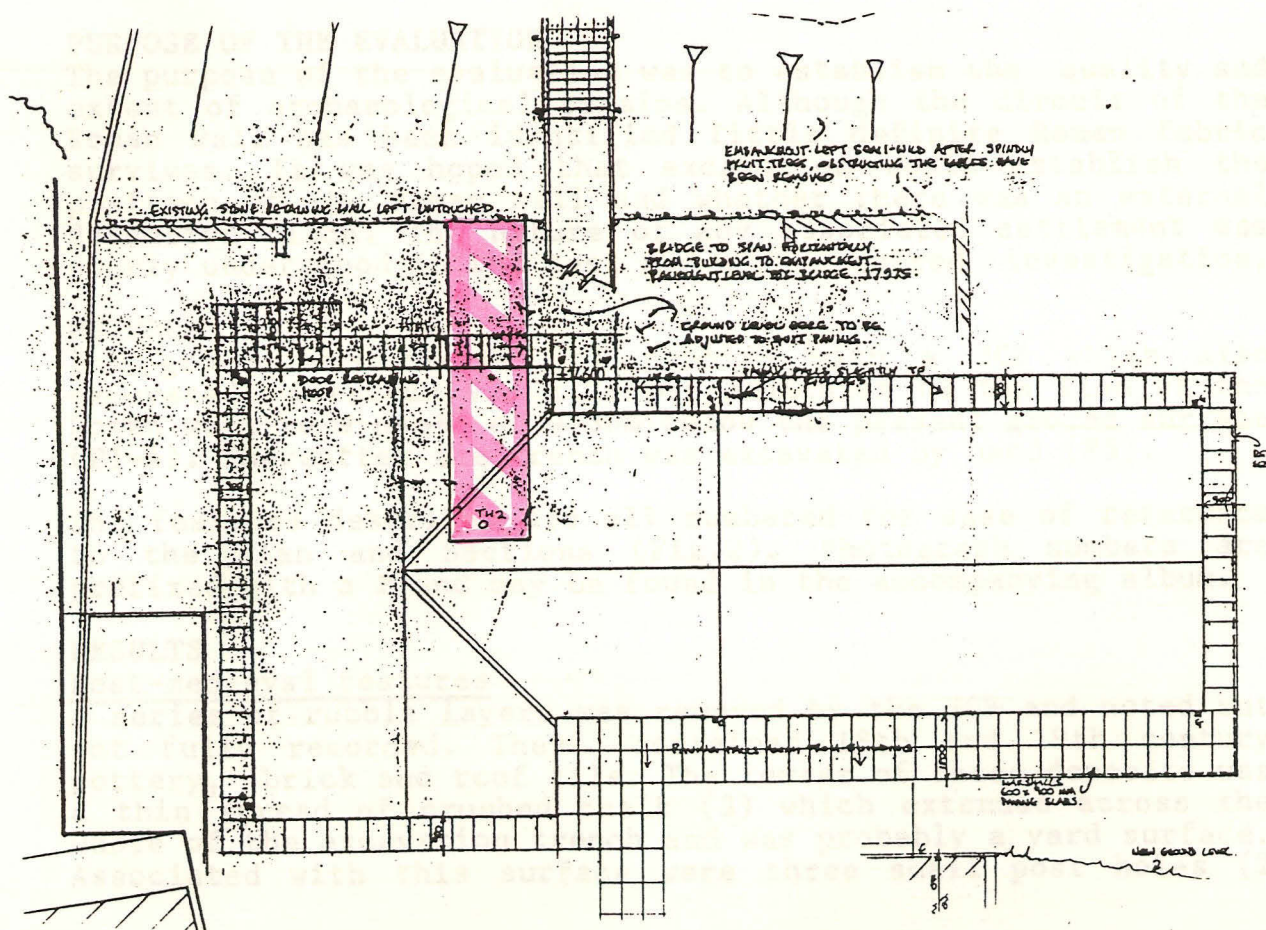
Location of excavation trench in relation to proposed building (architect's plan)
